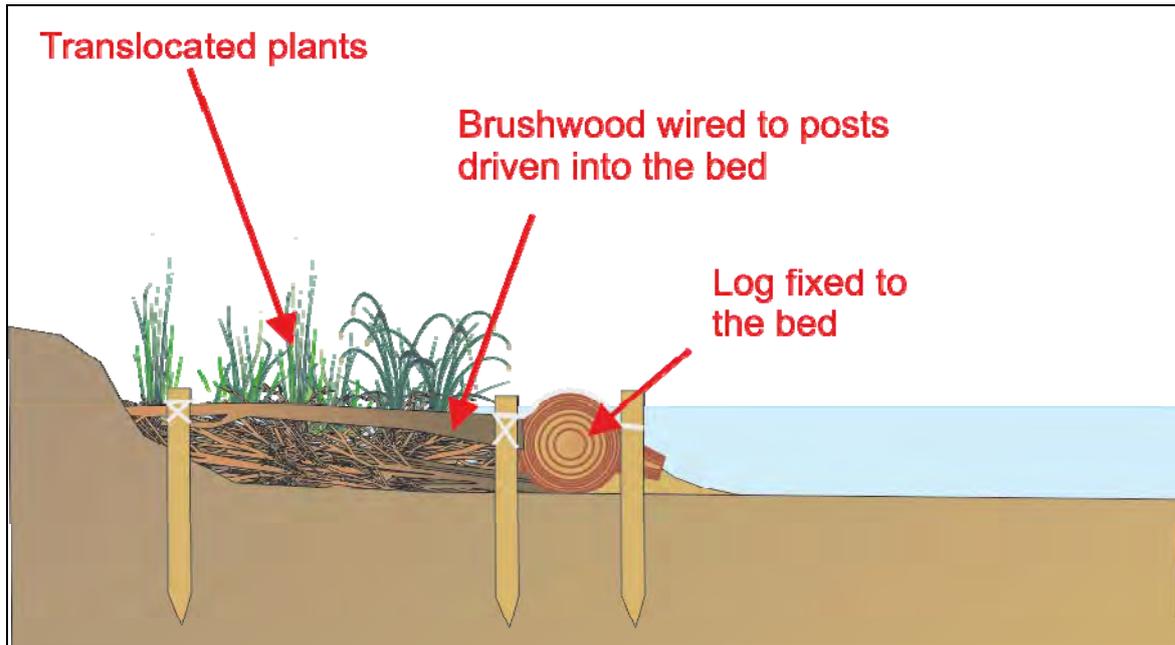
Cross-section of construction of brushwood berm – log and translocated plants optional.
